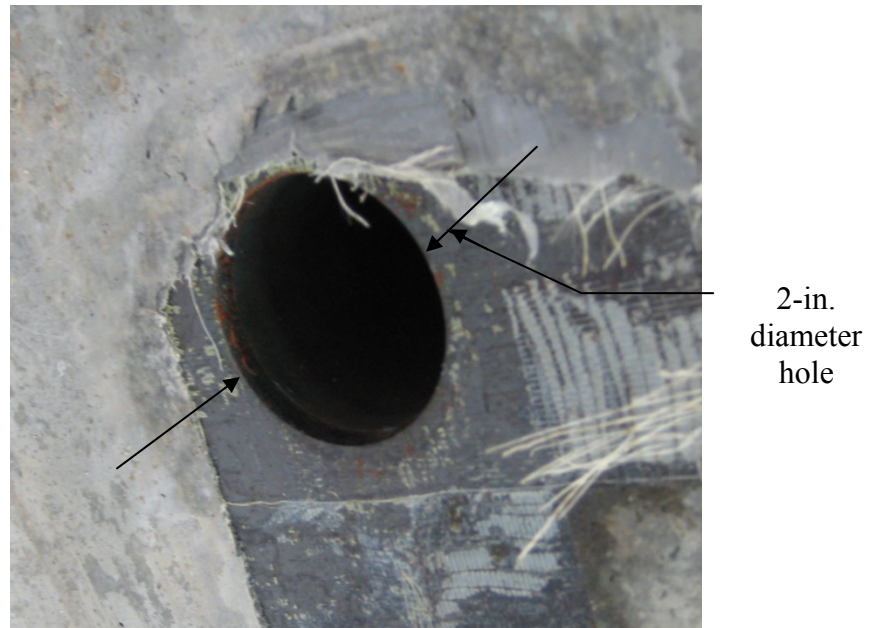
Bearing hole insert for fixed bearing in underside of girder
